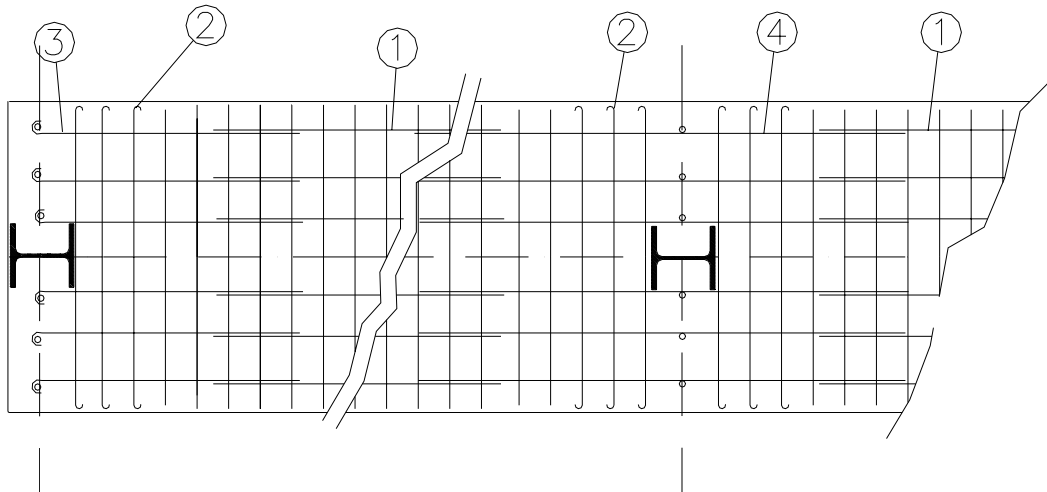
Reinforcement of the slab and anchoring on the transverse beam
